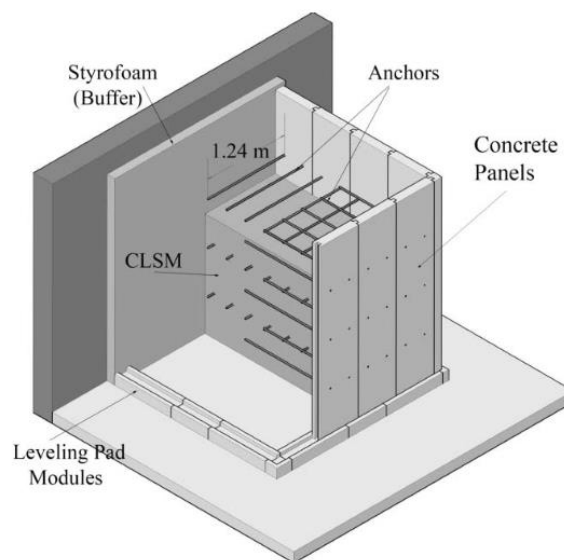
CLSM abutment in the Alizadeh (2016) study.
